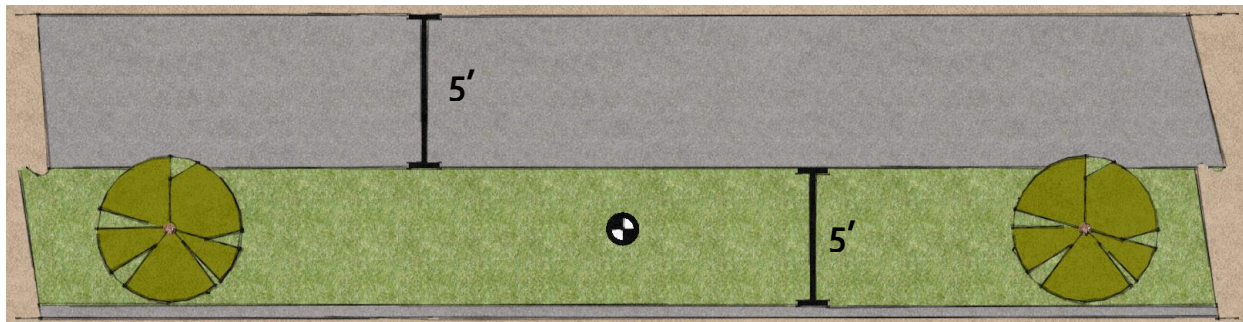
Transitional Downtown Streetscape Plan – Intermittent Grass Verge Design
